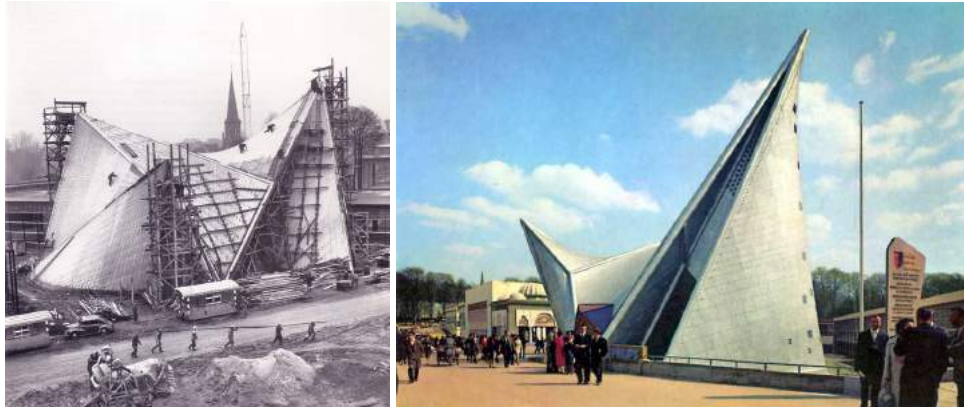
(a) Construction of the walls (b) Philips pavilion: Le Poème Électronique
